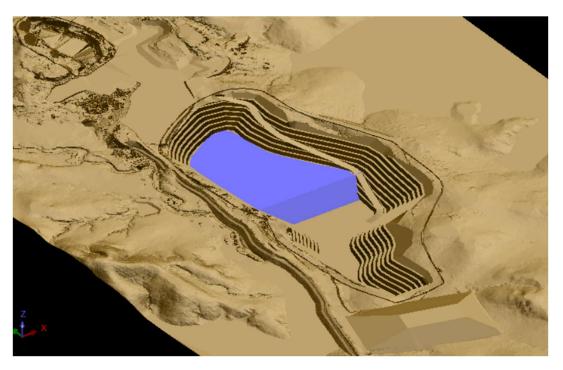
Inpit backfill at end of mine life, removal of the northern out of pit dump and levelling laydown area
